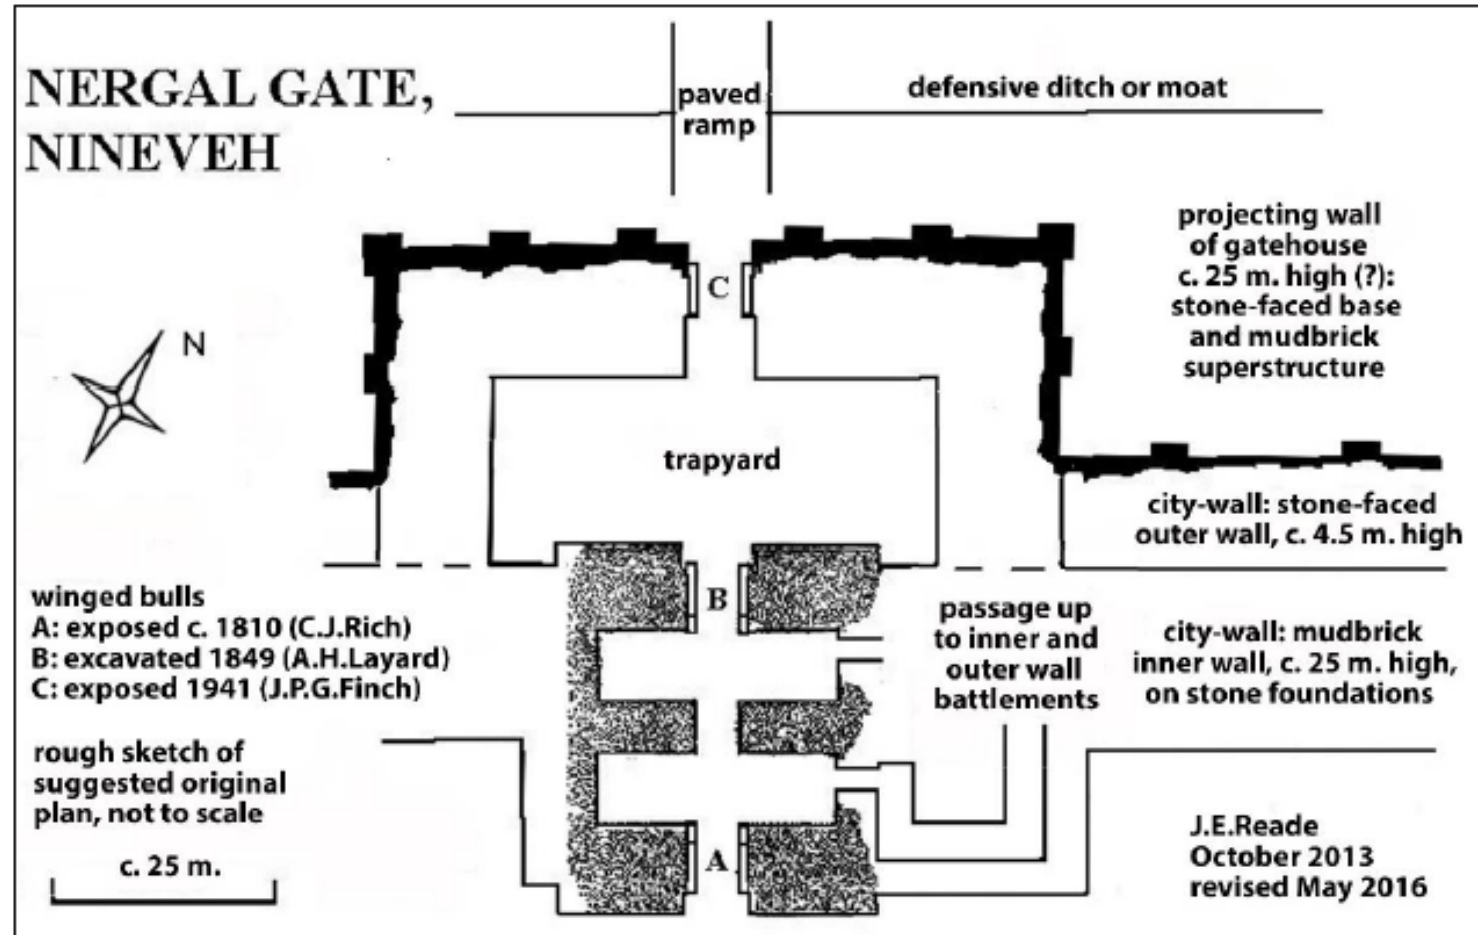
Schematic plan of Gate 10. Author's drawing, 2016.
